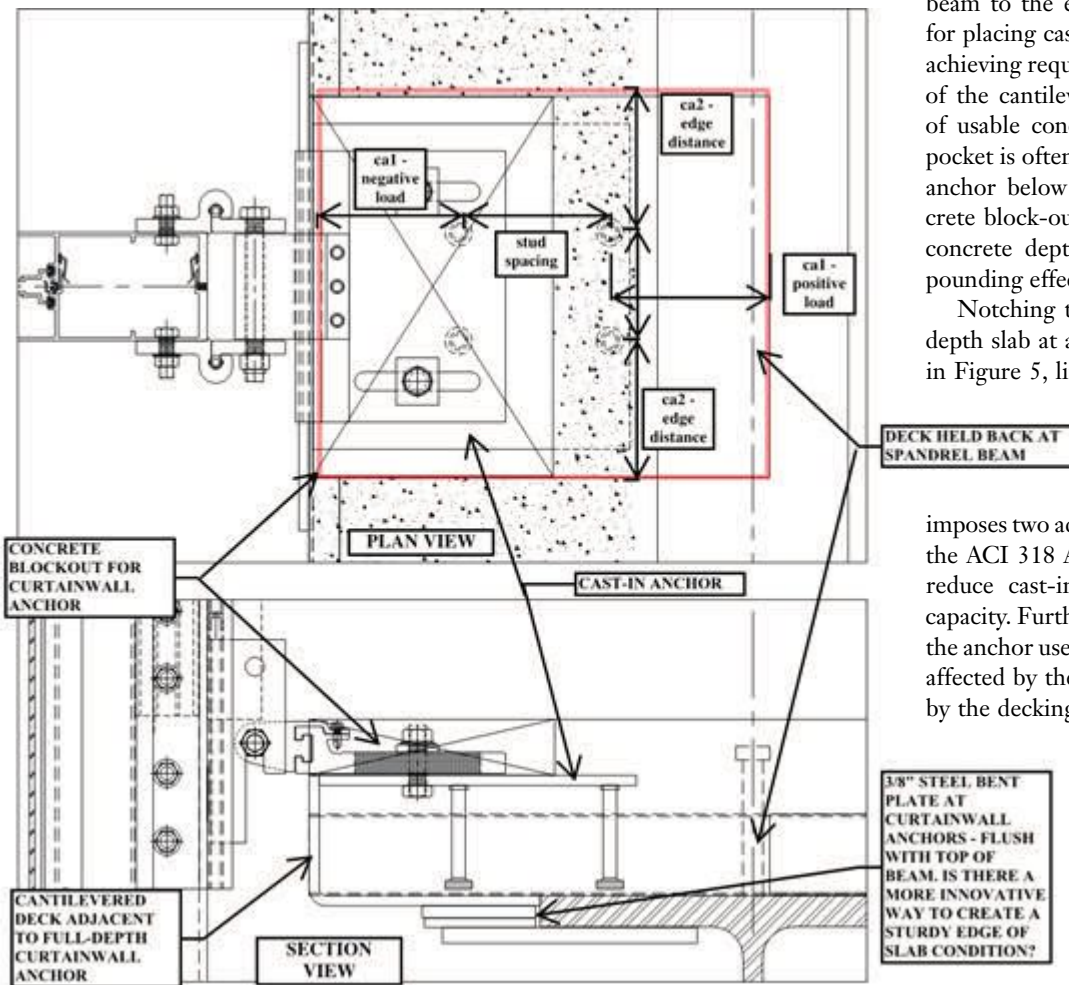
Cantilevered deck to edge of slab with notched slab at anchor.
